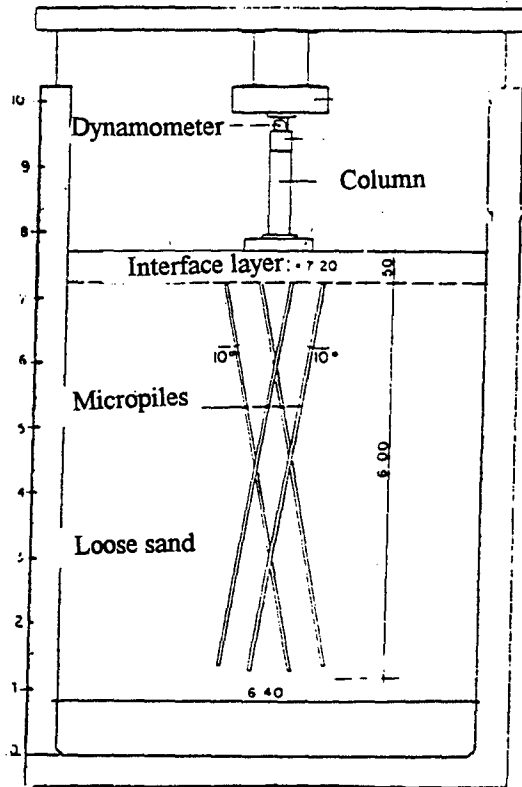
Setup of the full-scale experiment (Plumelle, 1984).
